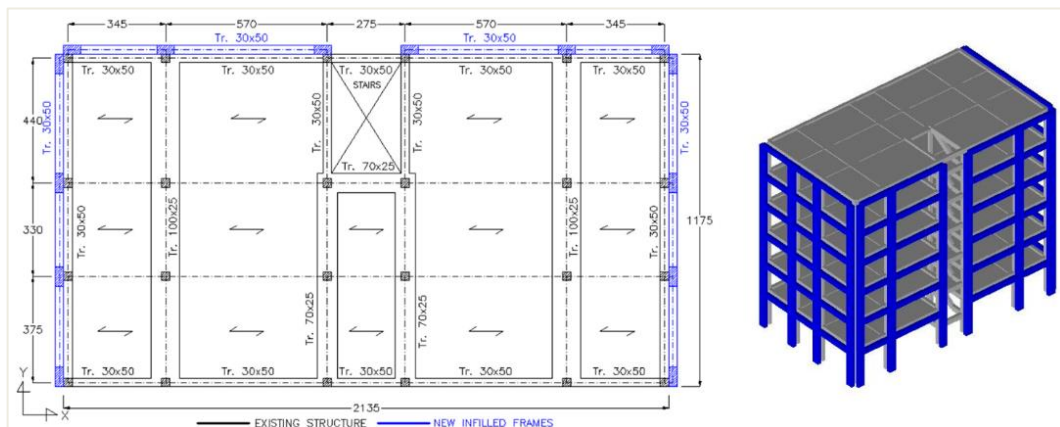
The plan and 3D view of the building reinforced with the C3 model (Manfredi & Masi, 2018)
